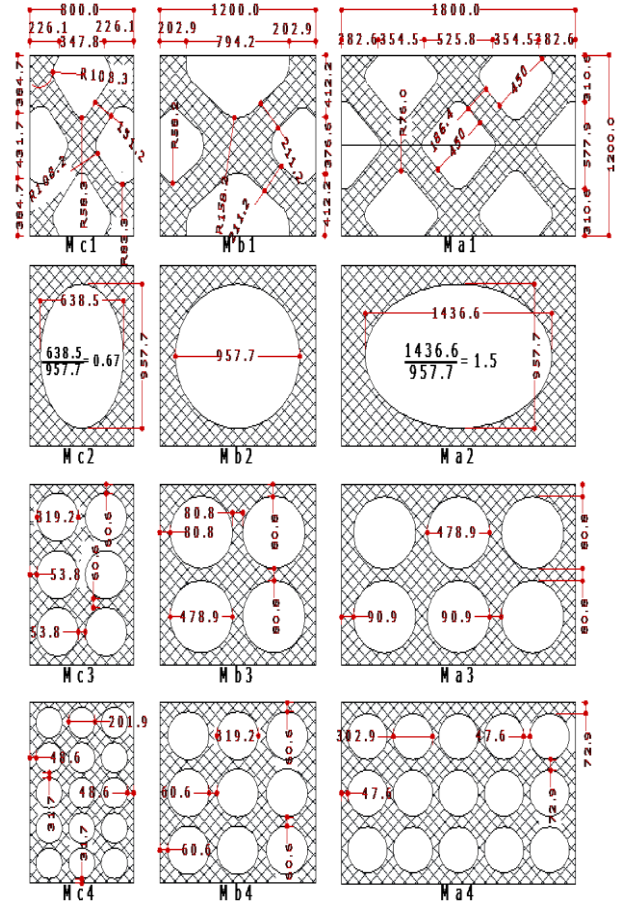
Optimized and perforated plates dimension (all in millimeter)
